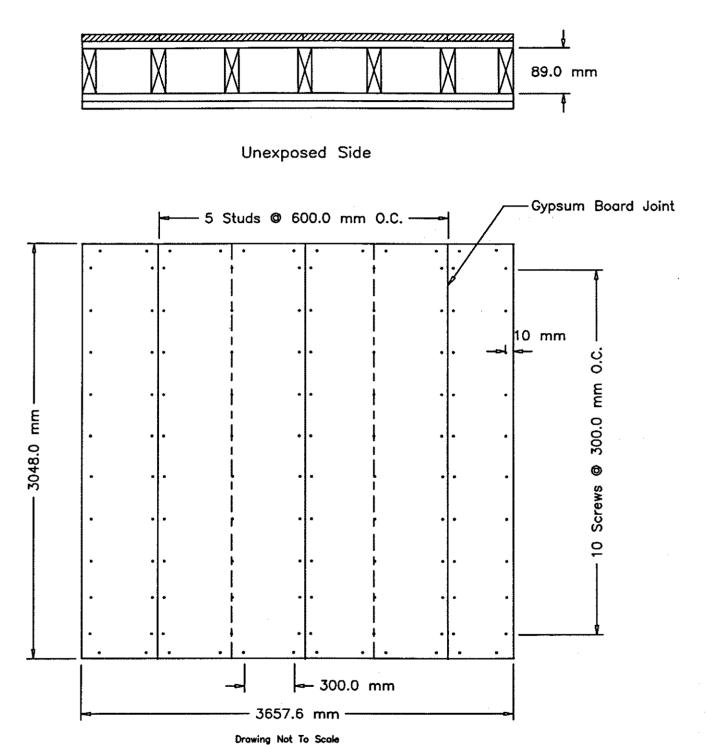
Screw Locations For Wood Stud (600 mm O.C.), 2x2 Gypsum Board Layers, Full-Scale Assembly, Face Layer Gypsum Board, Fire Exposed Face
